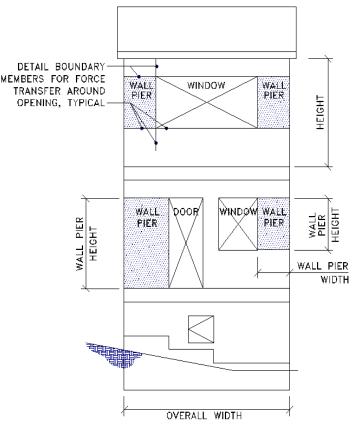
Alternate shear wall height-to-width ratio with design for force transfer around openings.
